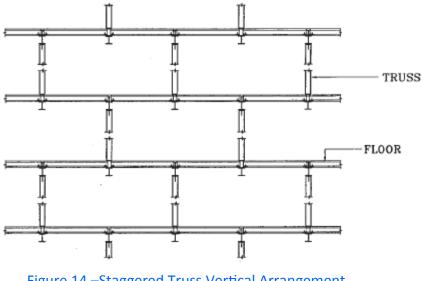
Staggered Truss Vertical Arrangement Image from AISC Design Guide 14
